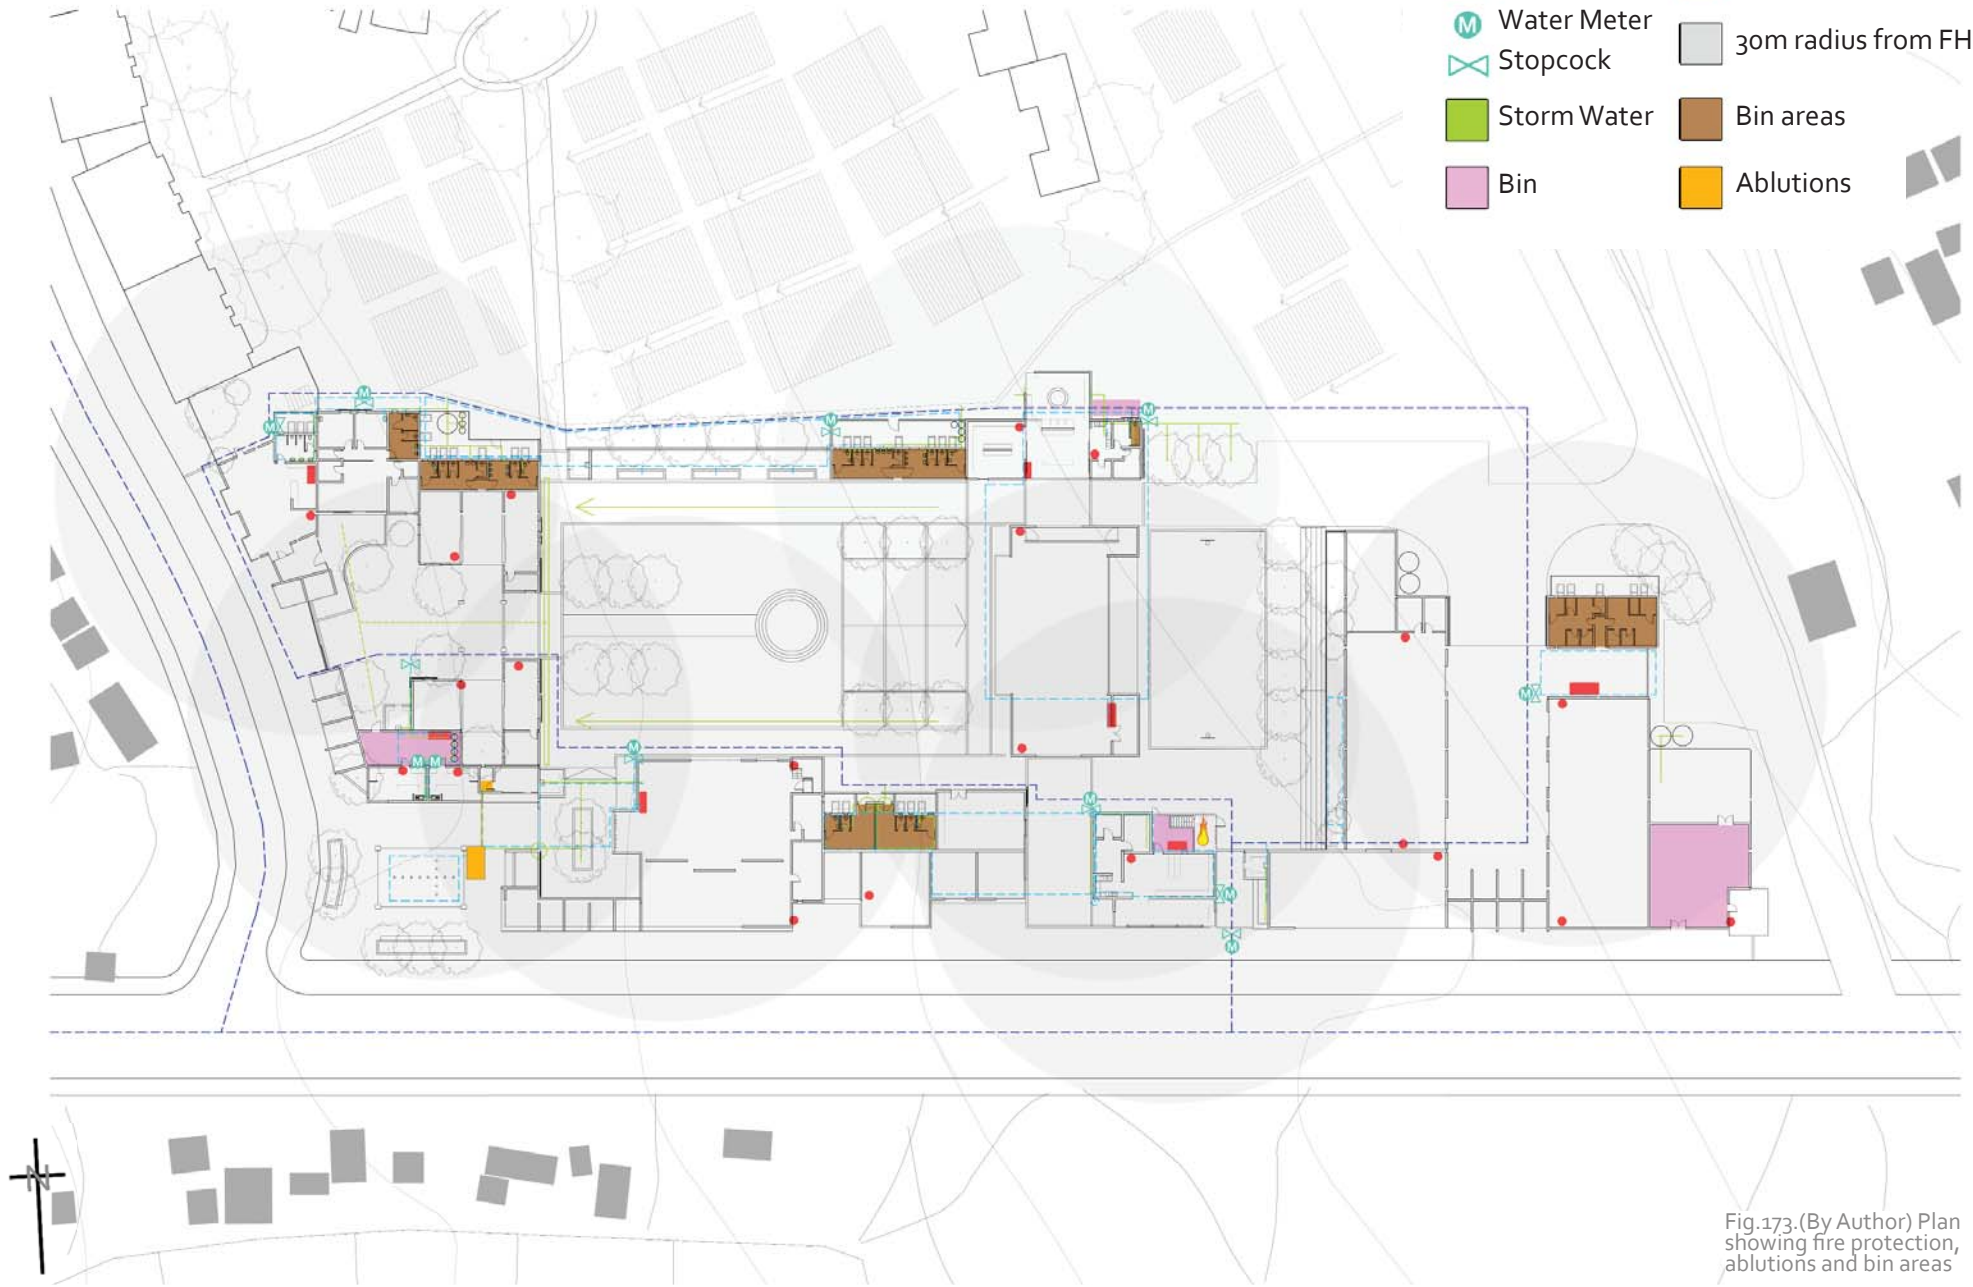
(By Author) Plan showing fire protection, ablutions and bin areas
